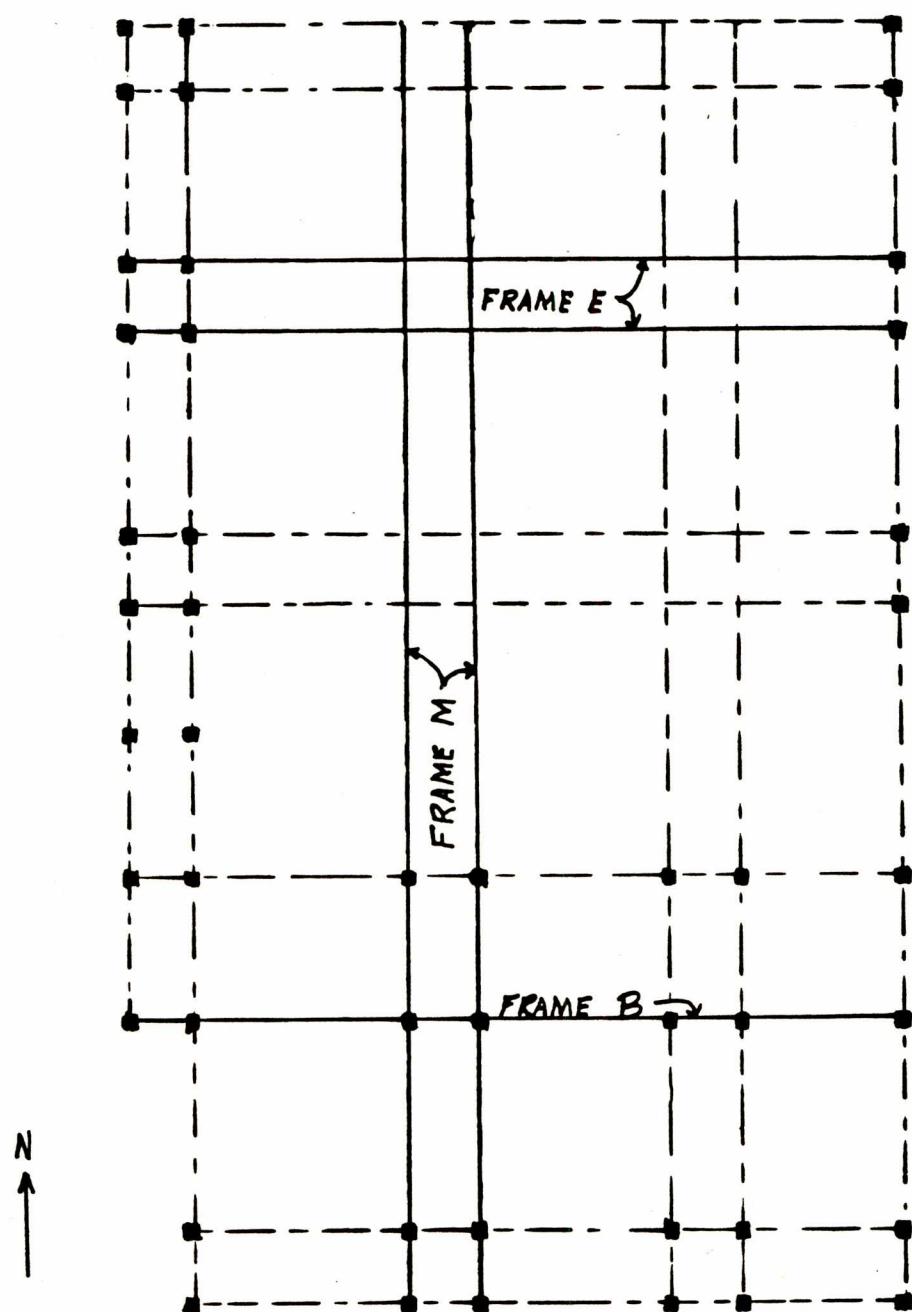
PLAN OF BUILDING SHOWING SELECTED FRAMES
